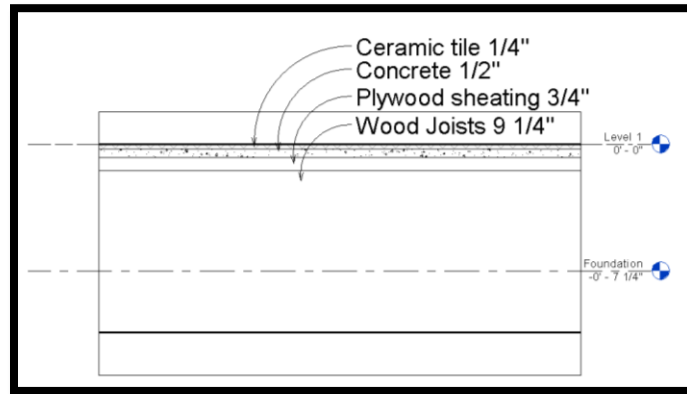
Apartment's Conventional Flooring for Bathroom Area.
